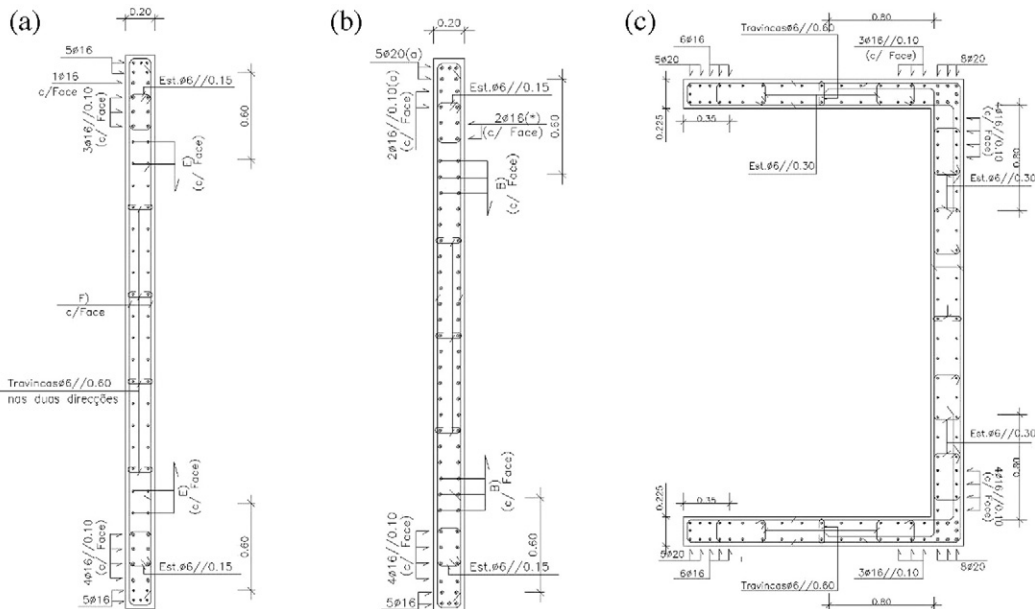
Shear walls details: (a): WA-1, (b): WA-2, (c): SW-1.
